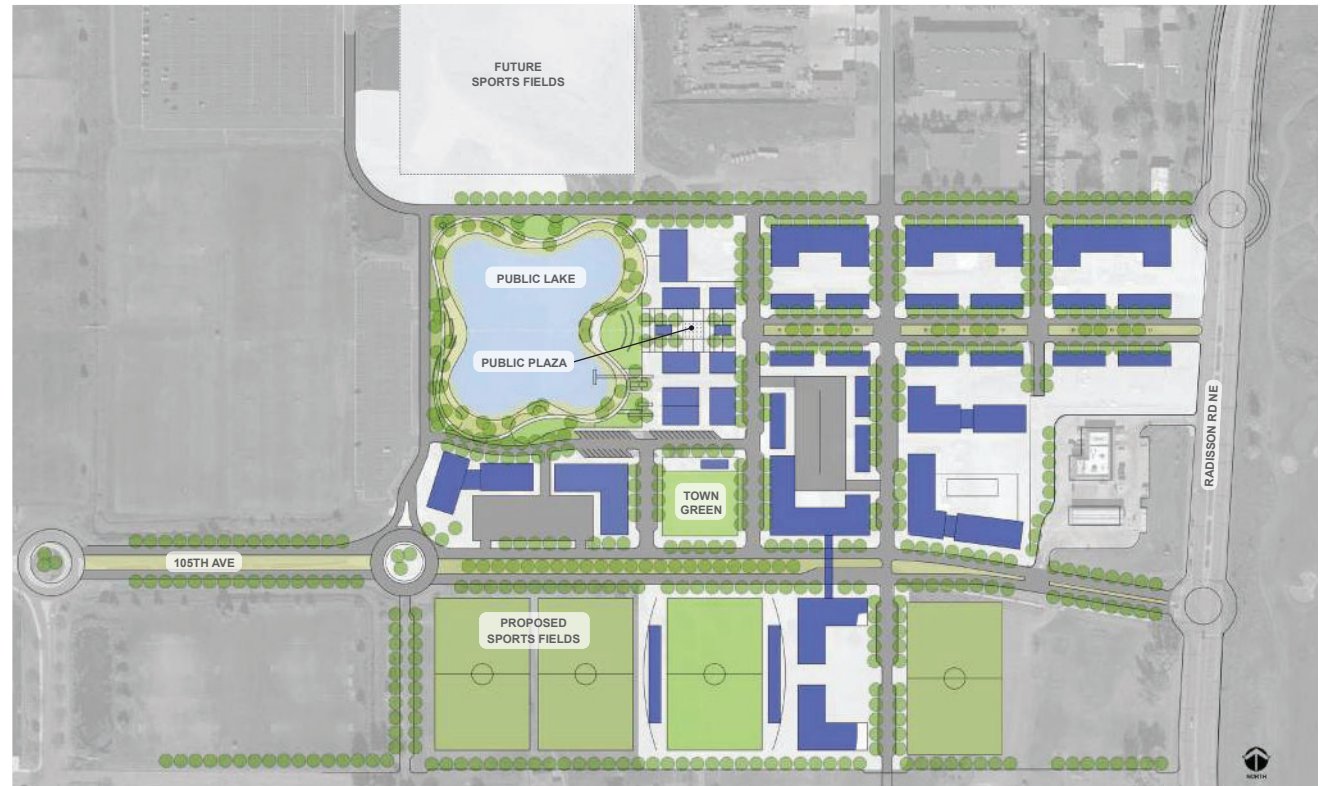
// BLAINE TOWN CENTER MASTER PLAN
